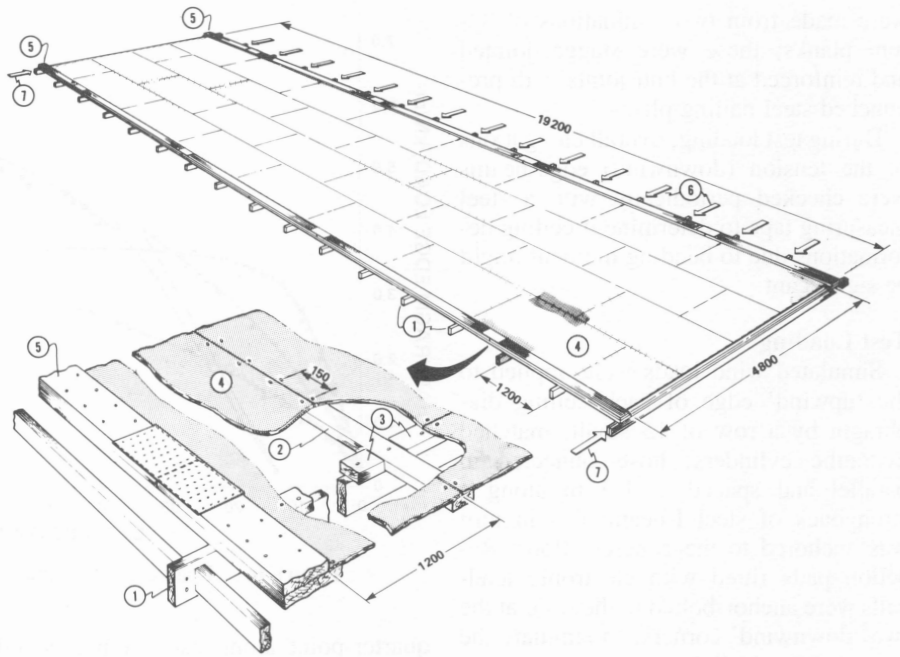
Details of improved plywood diaphragm model. (1) 38×140 -mm members represent ceiling joists or roof trusses; (2) 38×89 -mm longitudinal strapping spaced at 1200 mm; (3) 38×63 -mm blocking at (1) and between (2); (4) 7.5-mm sheathing fir plywood, perimeter of each sheet nailed to (2) and (3) at 150-mm spacing; (5) beam edge of 38×184 and 38×235 mm with steel splice plate at each staggered butt joint; (6) 15 hydraulic cylinders spaced at 1200 mm; (7) two reaction pads with load cells, anchored to warehouse floor.
